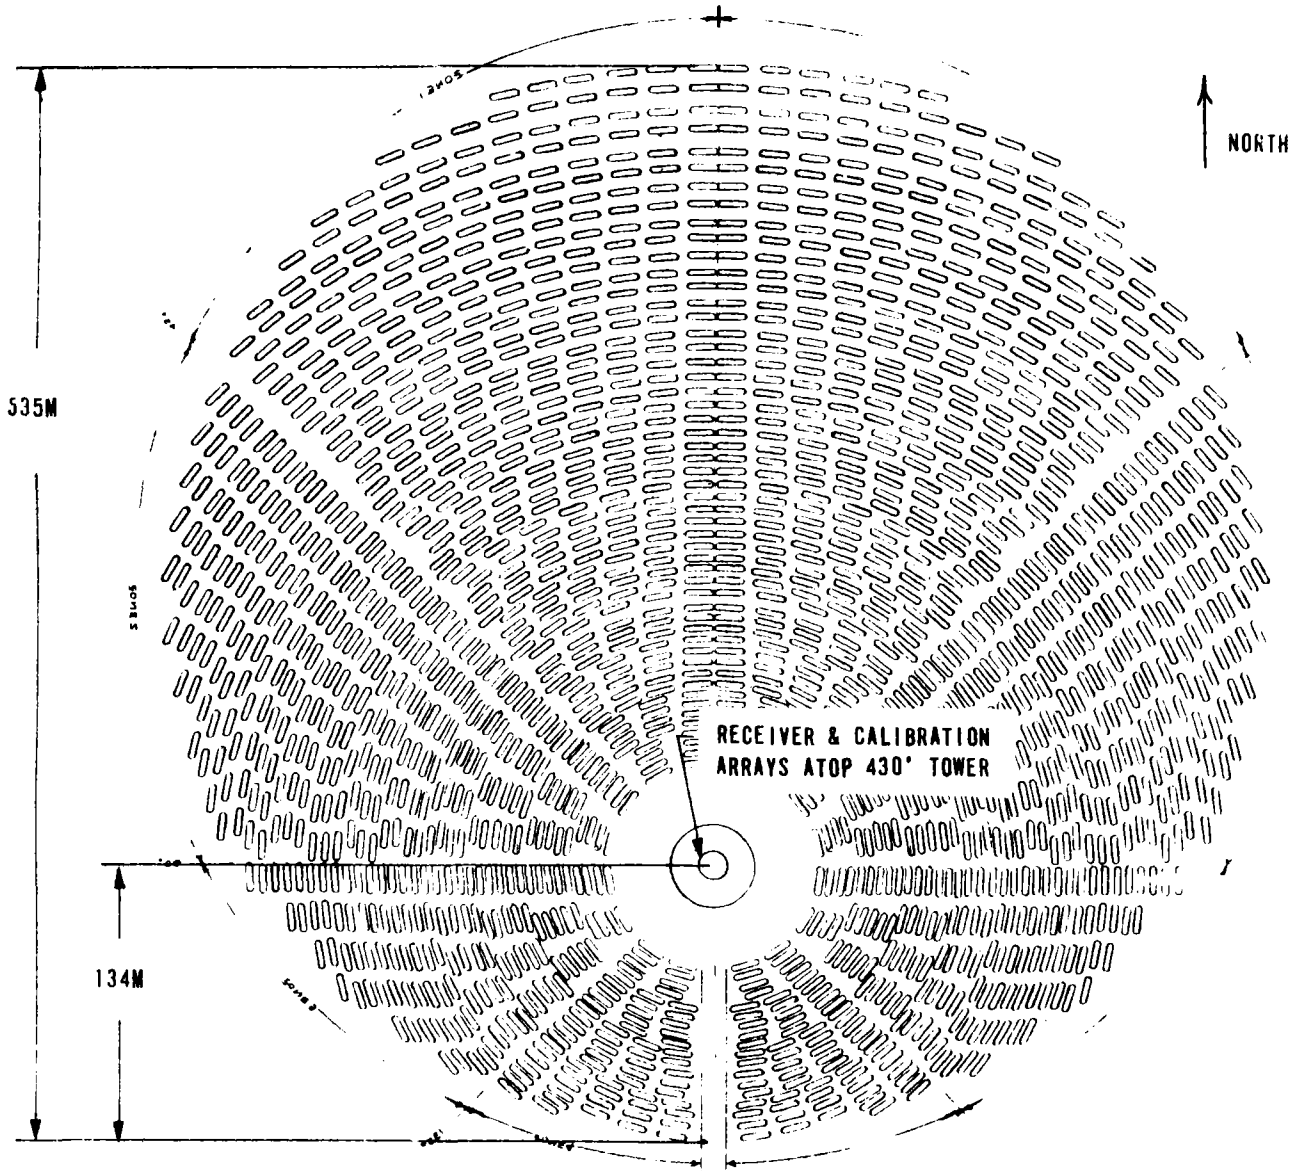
Collector Subsystem Tower One-Half South Field Layout
